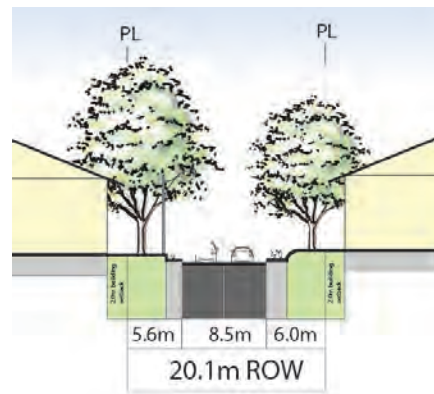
Gothic Avenue, illustrative street cross-section diagram.
